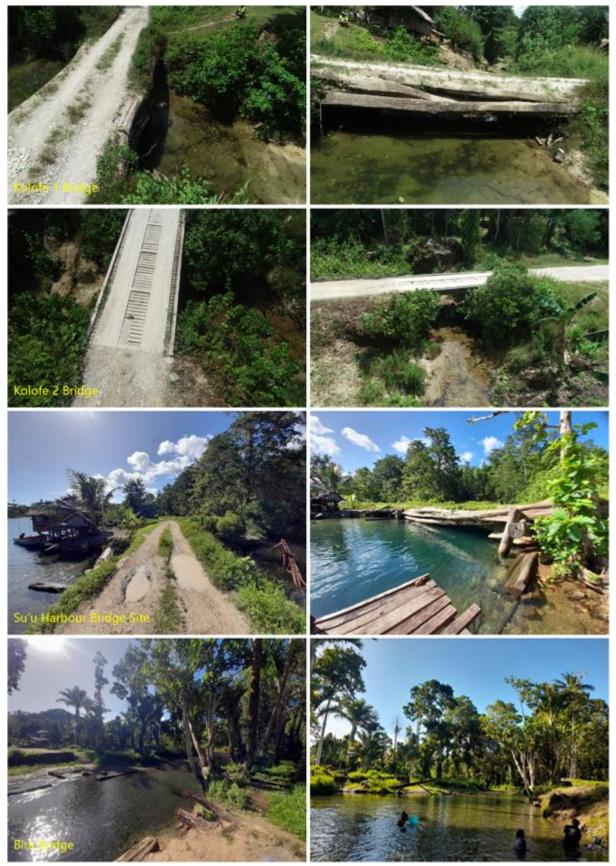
Photos of existing bridges conditions at Kolofe 1 &2, Su'u Harbour, and Bila bridges site (Photo credit: Azimuth Survey (2022))
